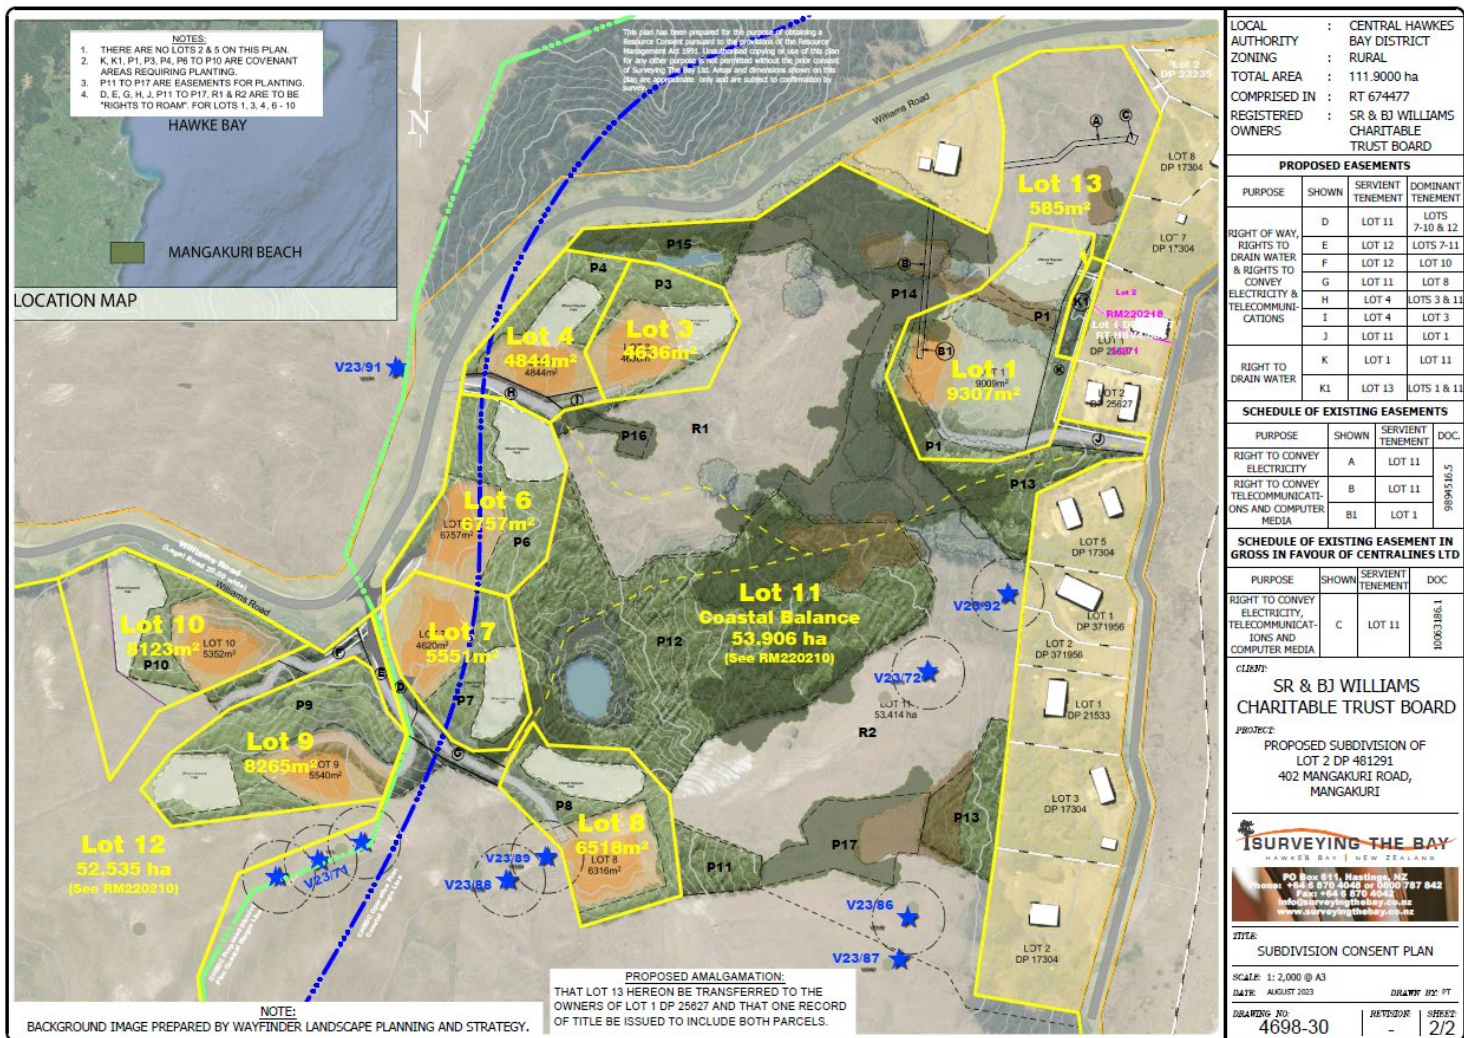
Proposed Scheme Plan (Source: Surveying the Bay)
